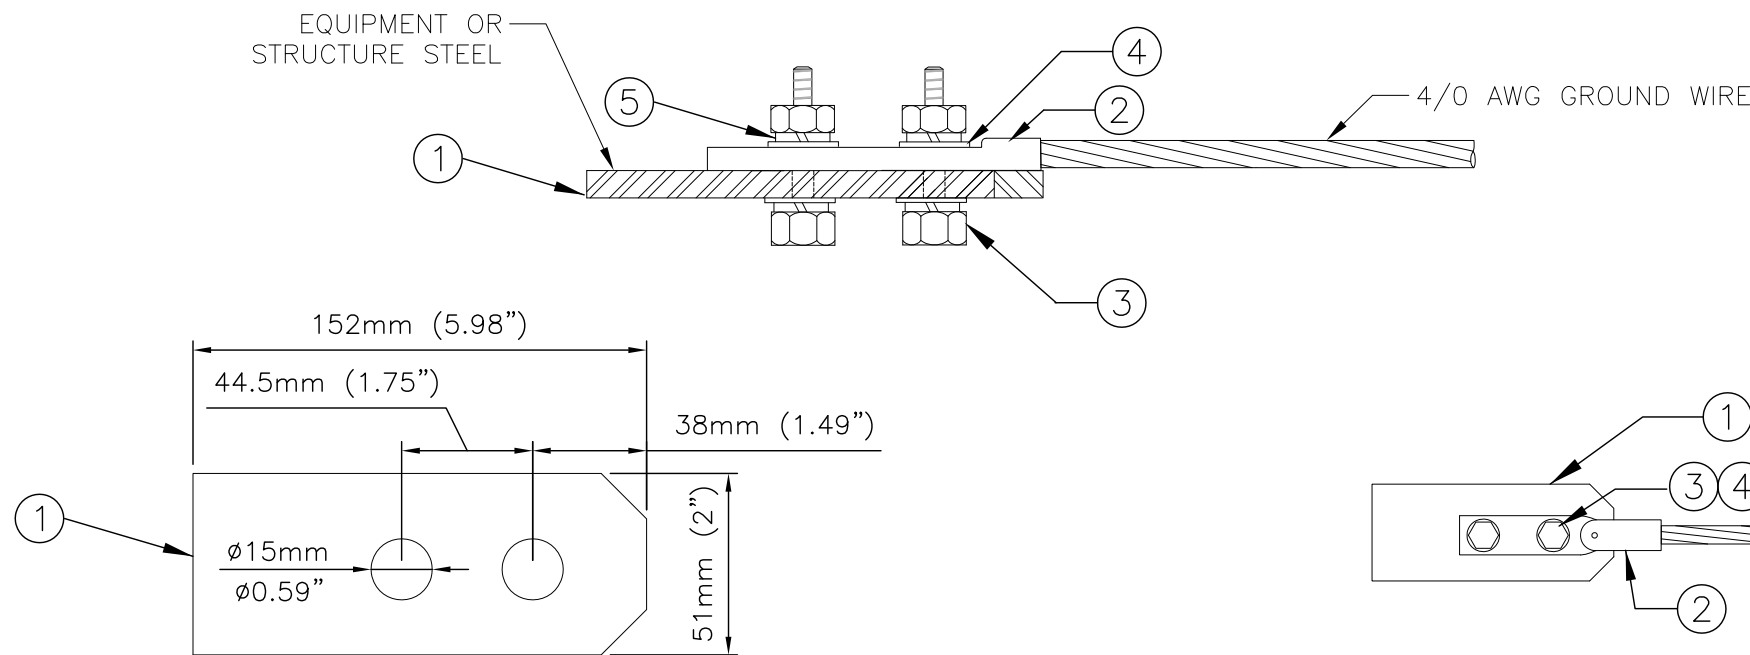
GROUND WIRE TO PLATE C/W SERVIT POST CONNECTION
